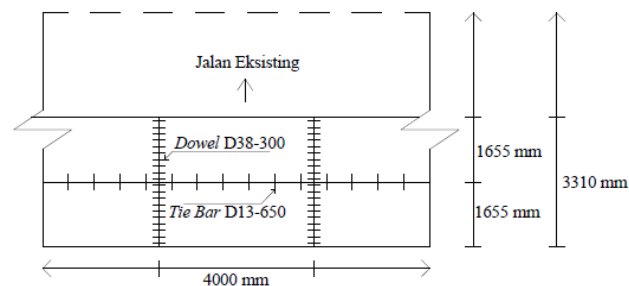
Drawing of Plan for Installation of Rods, Dowels, and Tie Bars
